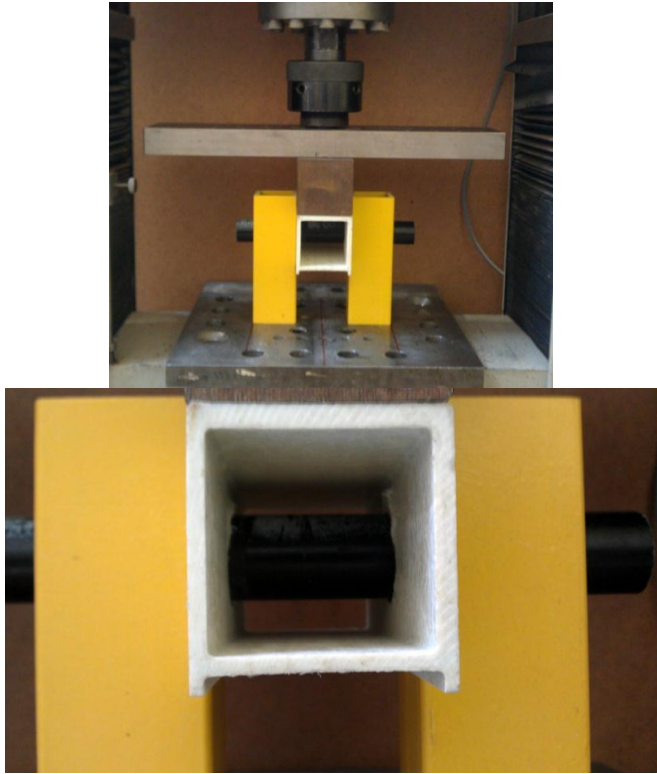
Warwick University specimens of stud-column section for Transverse dowel bearing strength. The right side photo for specimen WU-sc-Tdb-1A shows internal permanent deformation after bearing failure.
